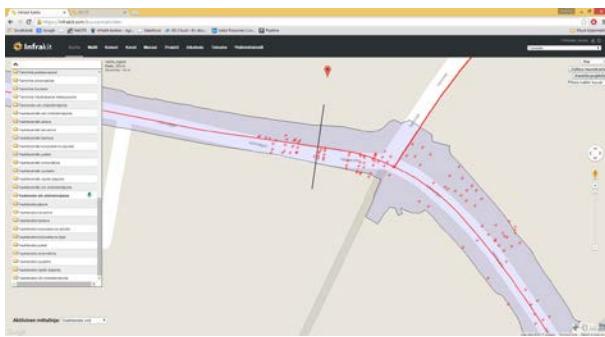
Measurements of pipe ditch cut in street renovation project shown on map. Ditch was realized in somewhat different form than designed (see cross section below).
